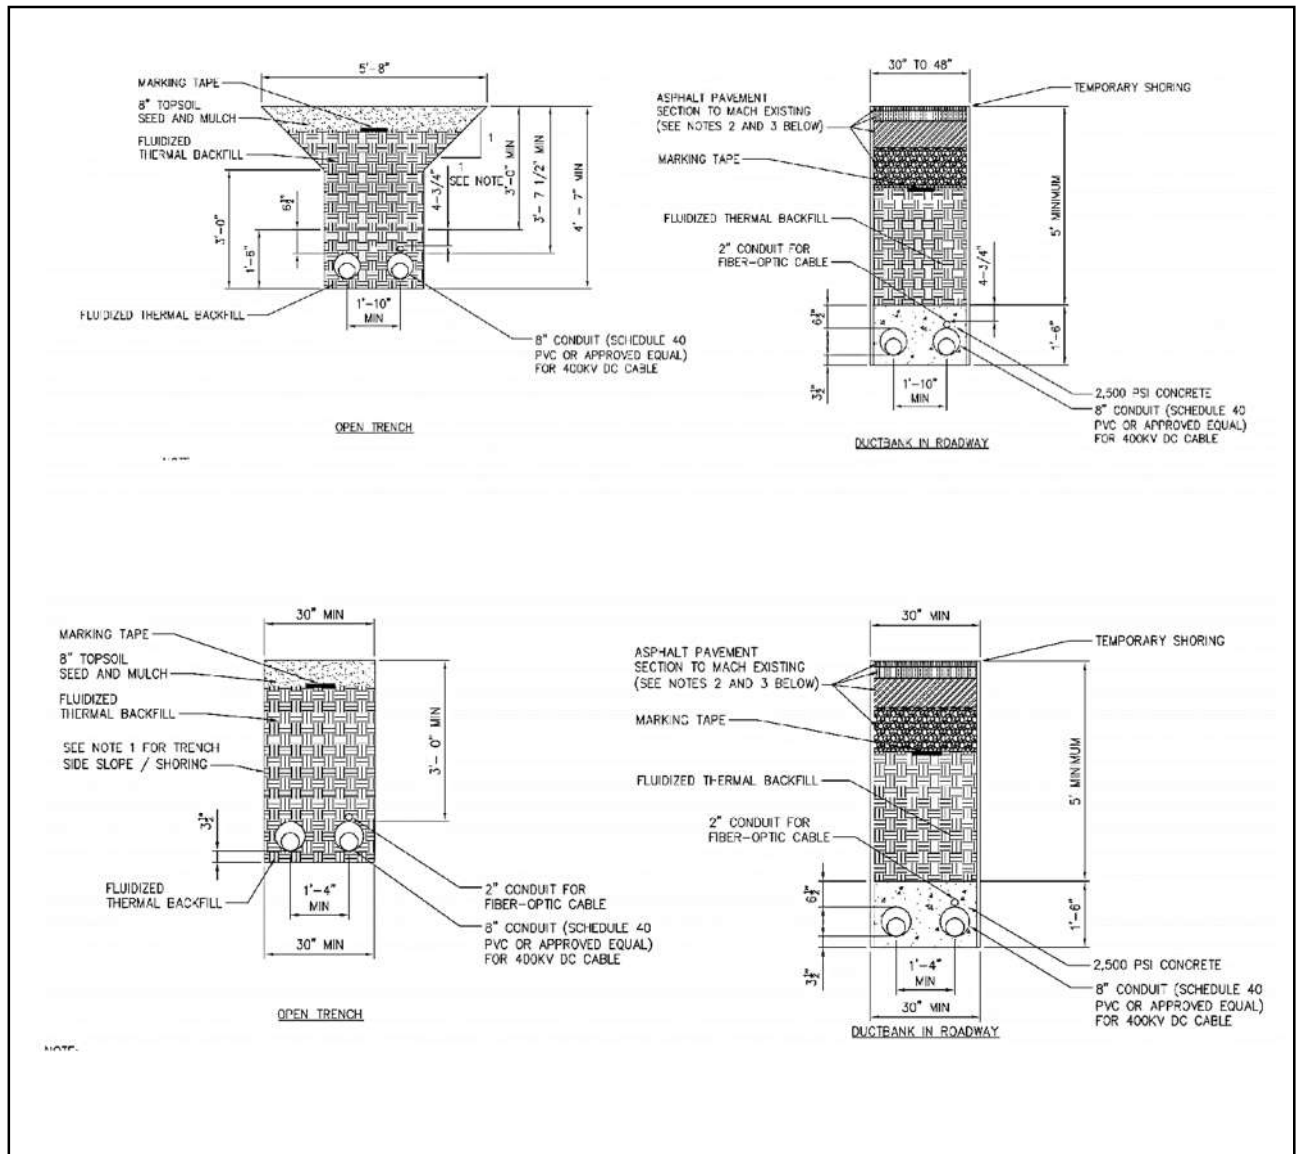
Typical open trench and duct bank (roadway) installation of the cable in the Putnam to Dresden portion of the Project, or Segment 1. Upper drawings are 36-inch-wide excavations; lower drawings are 30-inch-wide excavations.
